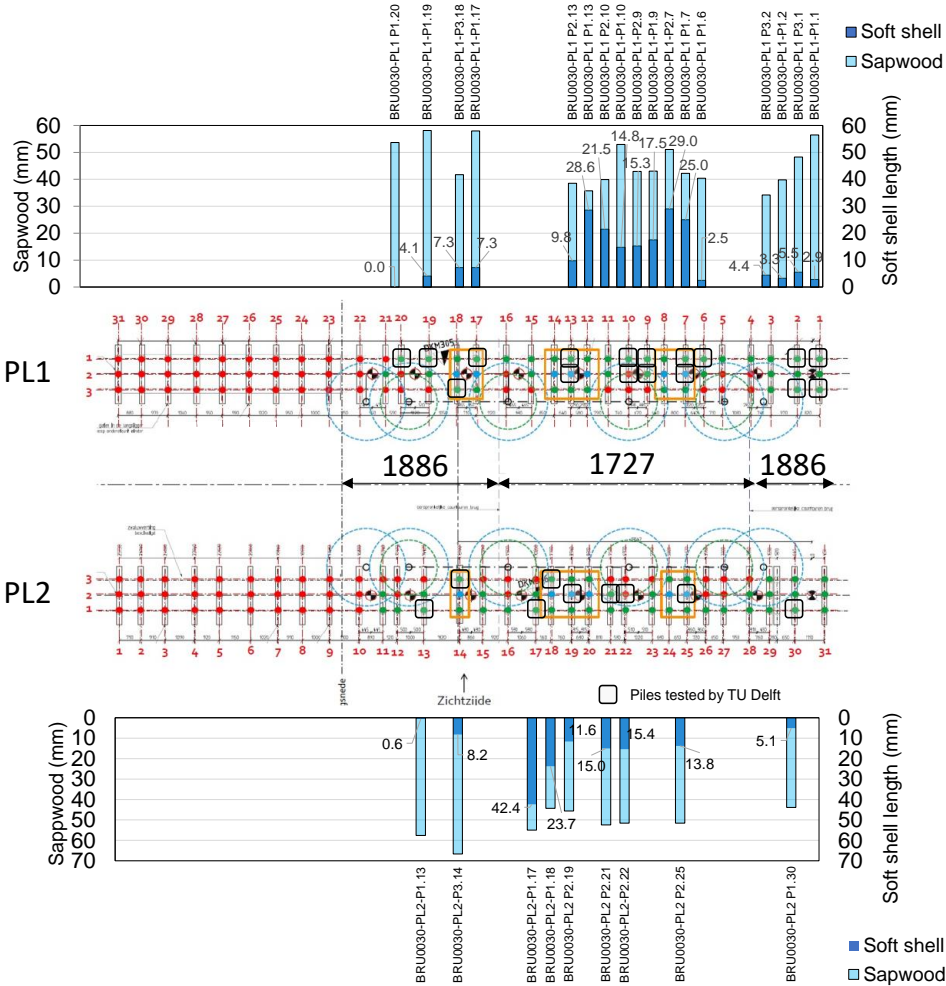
Bridge 30: overview of soft shell and sapwood of the head of the piles in the foundation plan.
